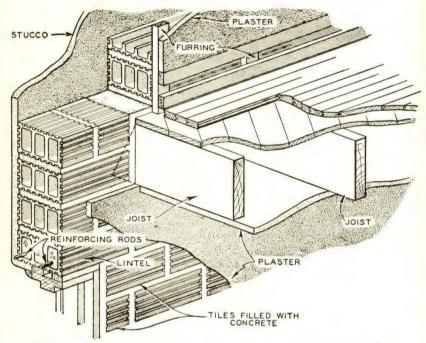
Method of Reinforcing Jamb Sections around Opening in Tile Wall
